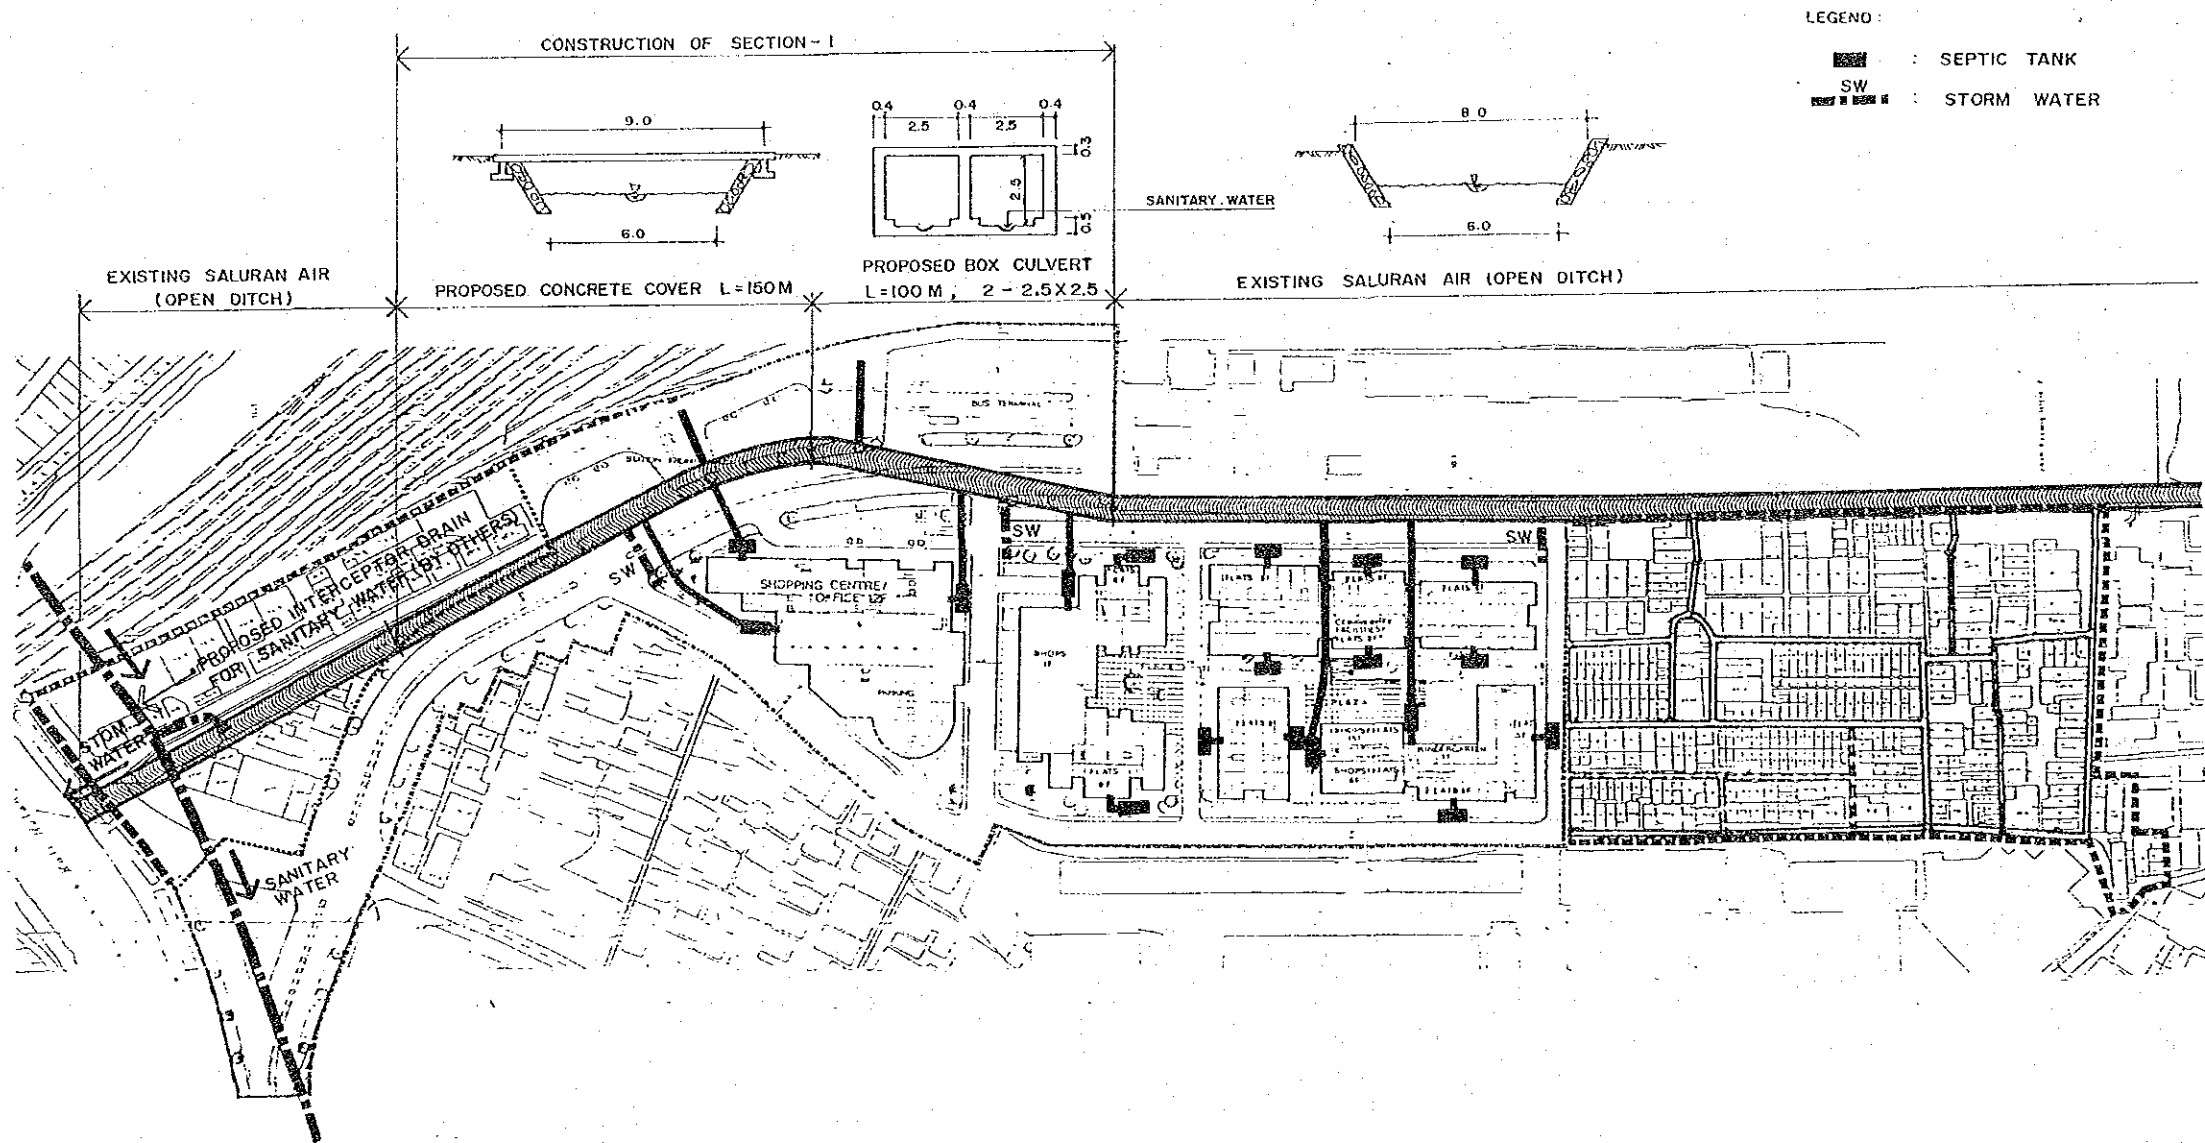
PROPOSED SANITARY AND STORM WATER DRAINAGE (SECTION-I ONLY)
